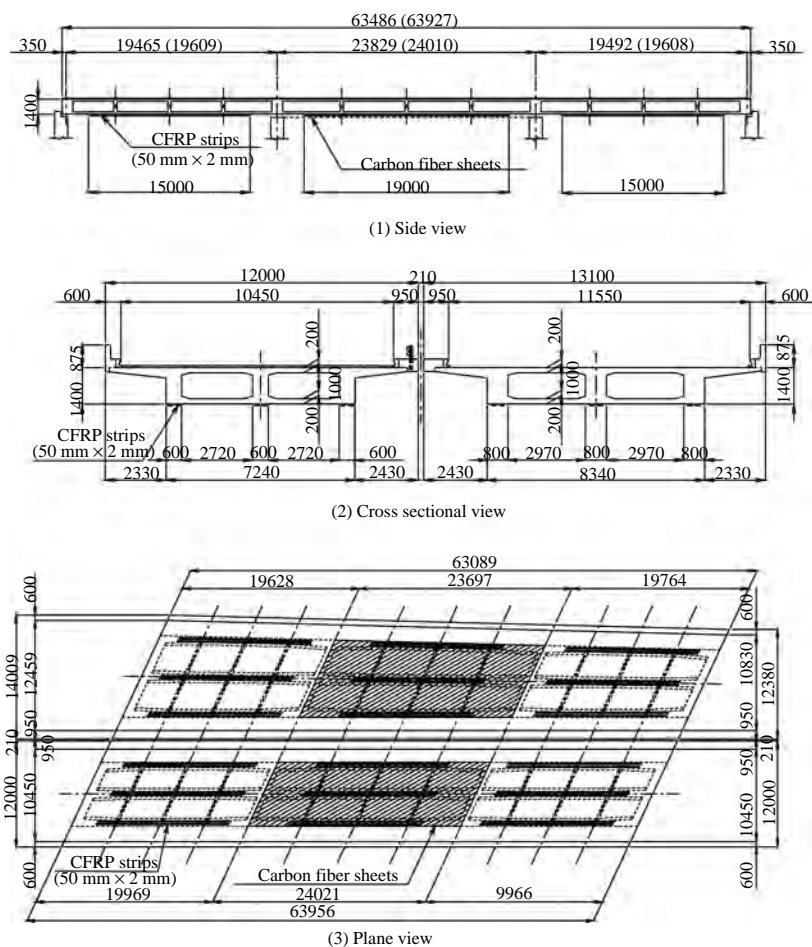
Allocation of CFRP strips and CFRP sheets (unit:mm)
